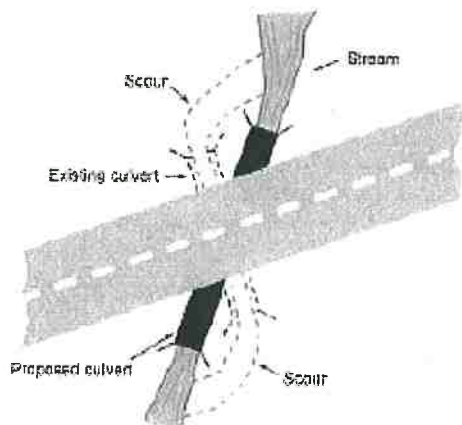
Culvert alignment should be in relation to the stream and not the road. It is important that the stream enters and leaves the culvert in a relatively straight horizontal alignment so streamflow does not have to turn to enter the inlet or discharge into a bank as it exits. This figure shows a redesigned culvert installation that replaces the bending alignment that previously existed. Channel turns at the inlet increase plugging potential because wood going through the turn will not align with the inlet. Similarly, channel turns at the inlet and outlet are often accompanied by scour against the channel banks (Wisconsin Transportation Information Center, 2004).
